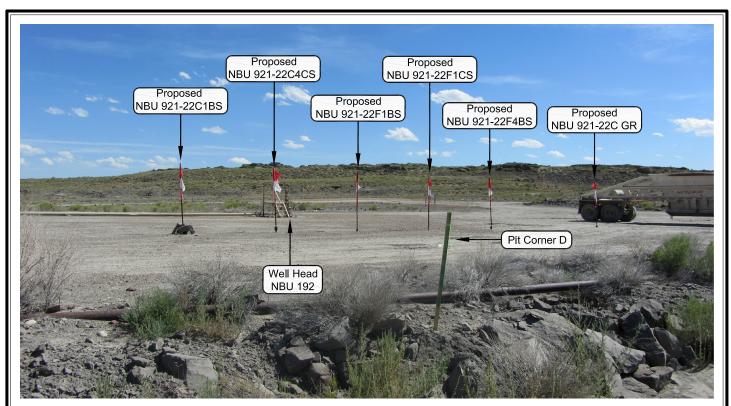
PHOTO VIEW: FROM PIT CORNER D TO LOCATION STAKE
